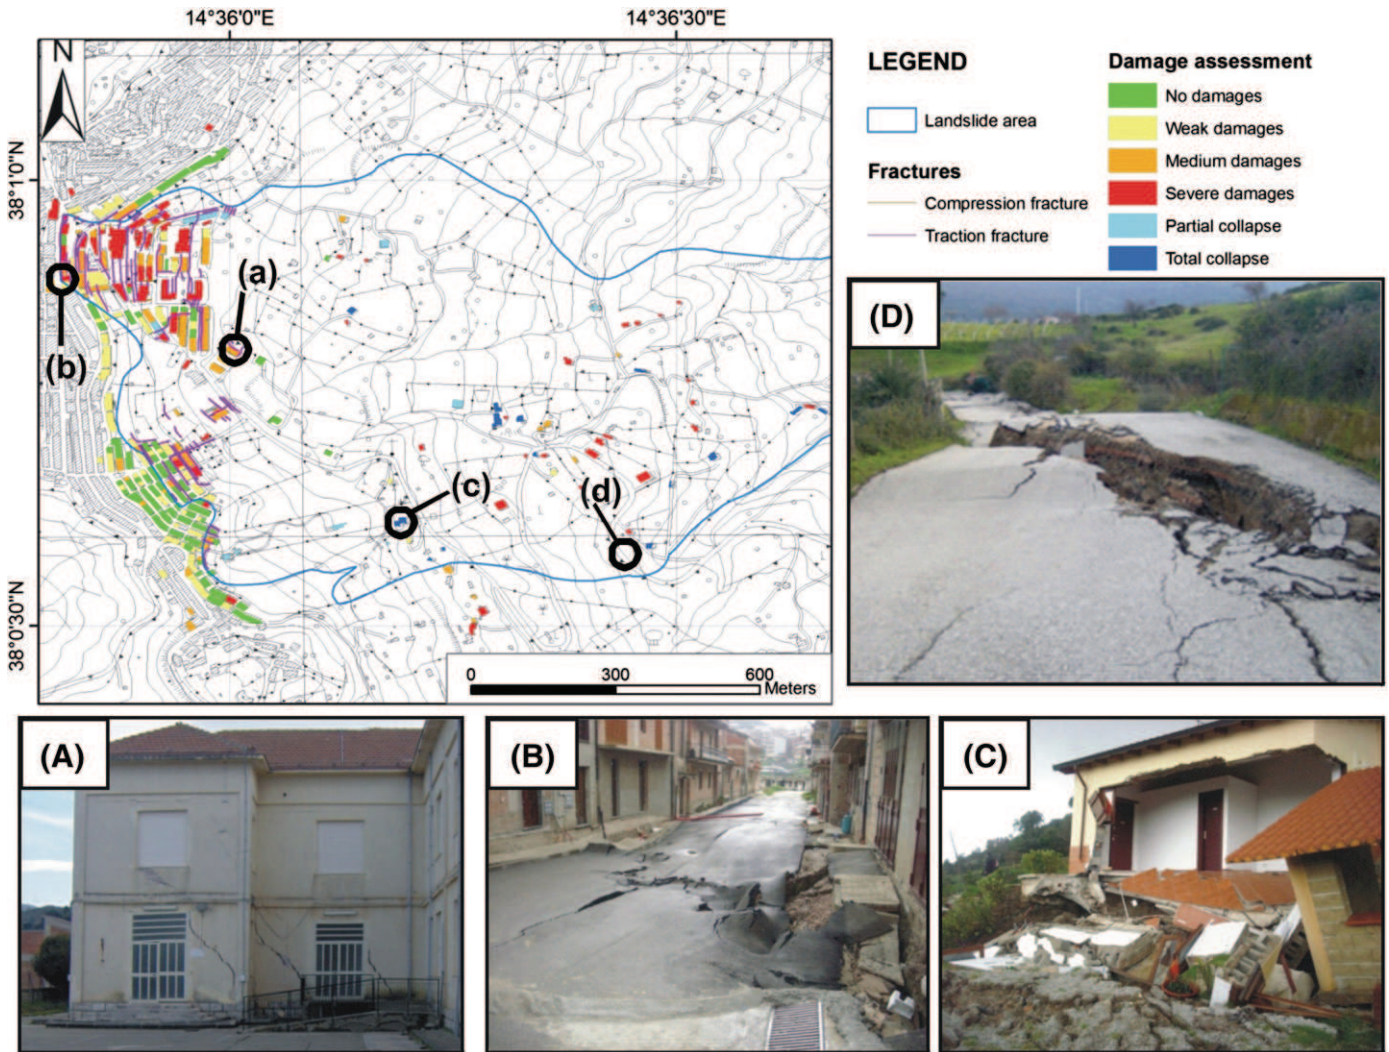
Building damage and fracture pattern maps (courtesy of the Regional Civil Protection Department, Sicily) and example of ground deformations and damages to buildings and structures in the 2010 landslide area (A, structural damages to the primary school building, Stazzone Quarter; B, damages to the pavement of Latteri Street; C, building failure in San Benedetto quarter; D damages to local road in Porcaro Quarter).
